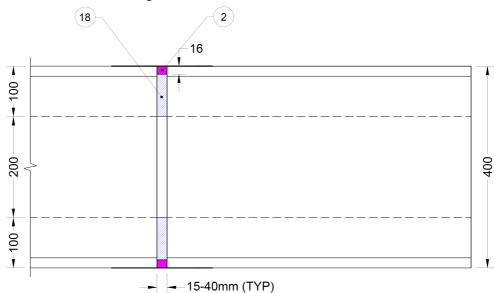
Service Panel Type 1 Joint Detail –Plan View
